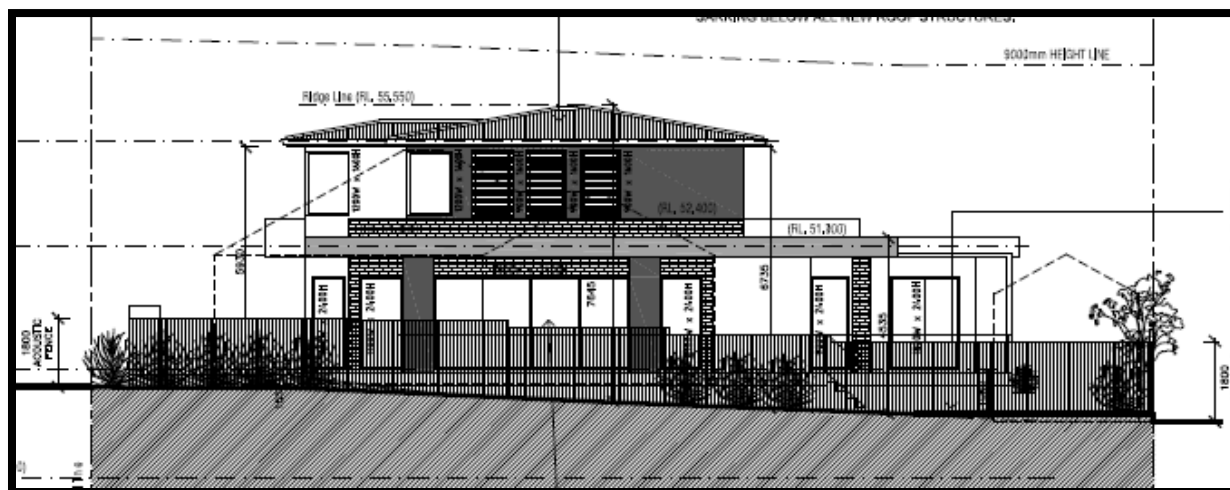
North west (Junction Road frontage) Elevation at 49 Jersey Avenue Mortdale (Source – NDGroup Architects)
